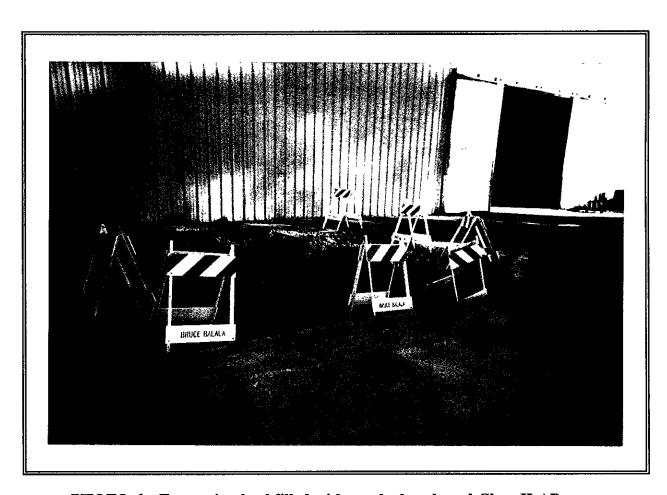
Excavation backfilled with crushed rock and Class II AB.
